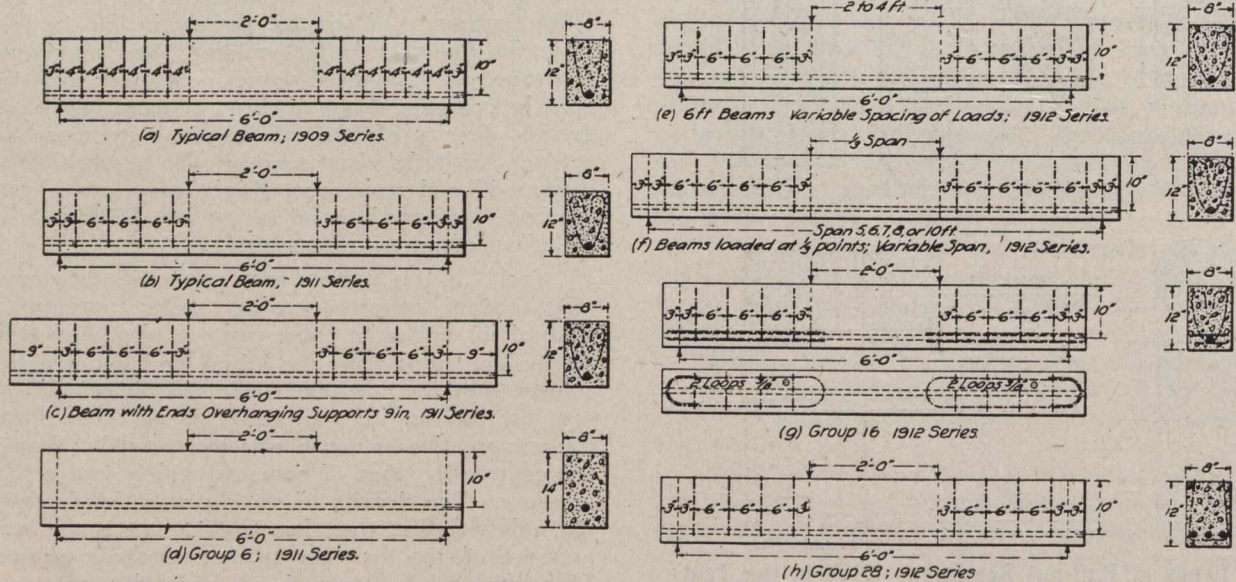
Typical Forms of Reinforced Concrete Beams Used in the Tests.
